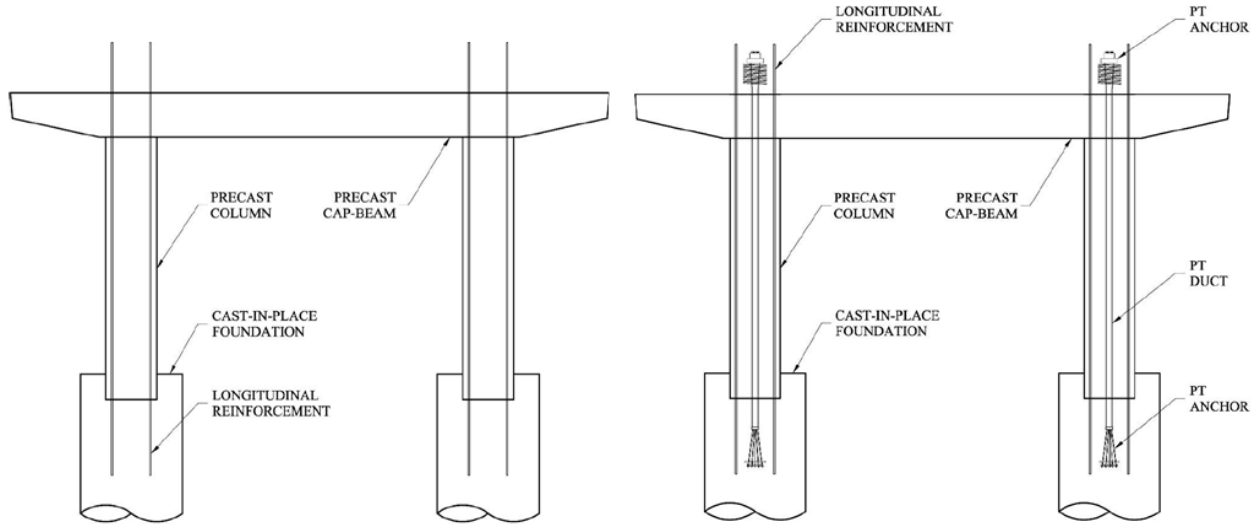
Proposed precast bridge bent systems by Hieber et al. 2005b
